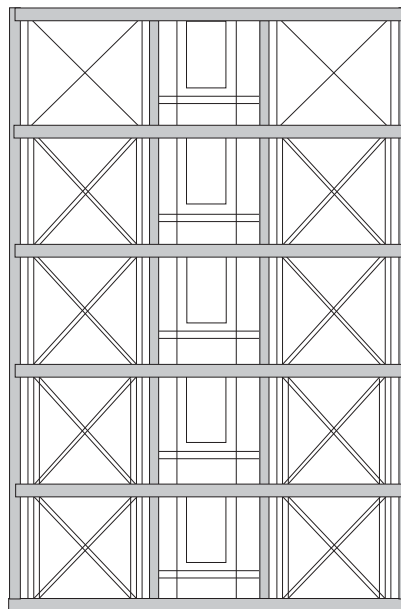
Layout of reinforcing carbon fibre on a RC building with masonry infill and five floors.
